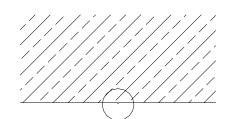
Frame profile with plywood facing – negative impression of the frame in the concrete when using a conventional plywood facing.
